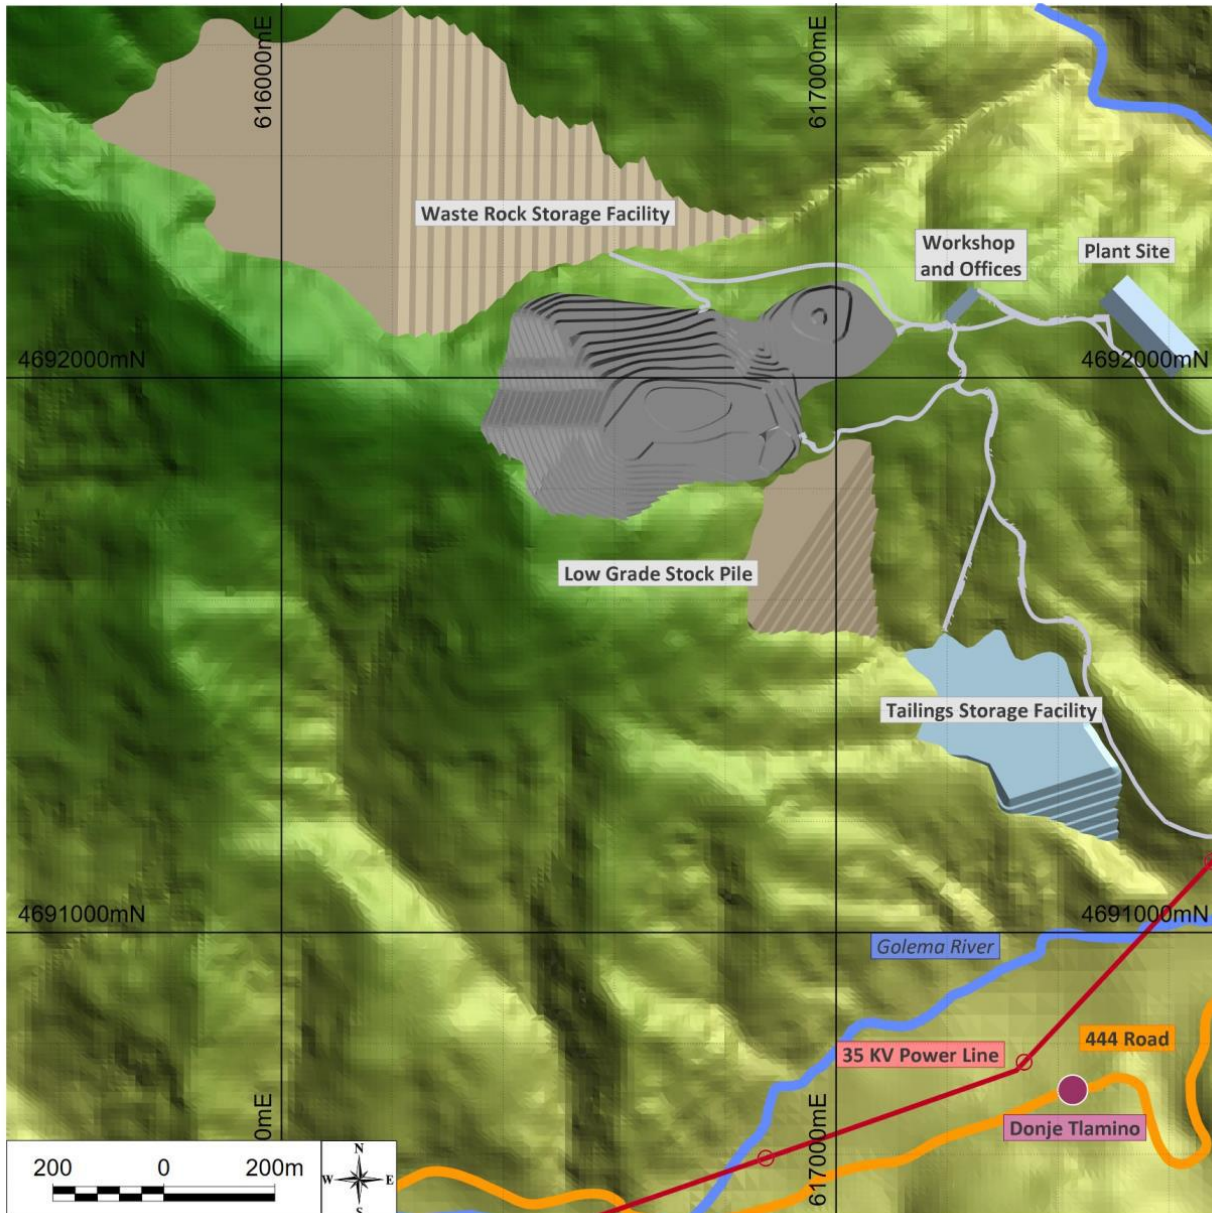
Plan View of Pit Limit and location of the WRSF and LG Stockpile
